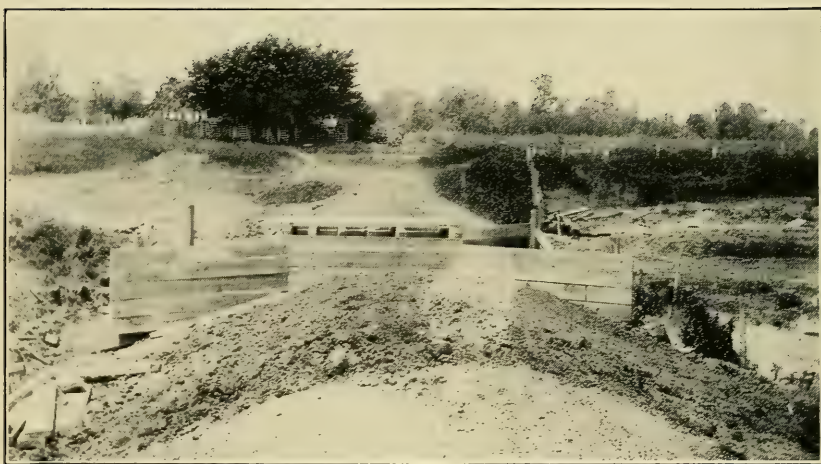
View across Bayou Walnut showing wing walls of spillway and bridge over spillway box.
